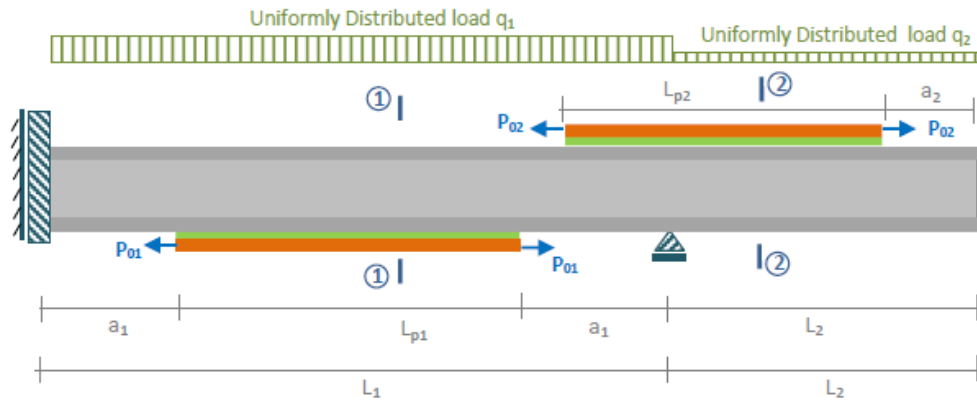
Steel beam strengthened with prestressed carbon/glass hybrid laminated plate
